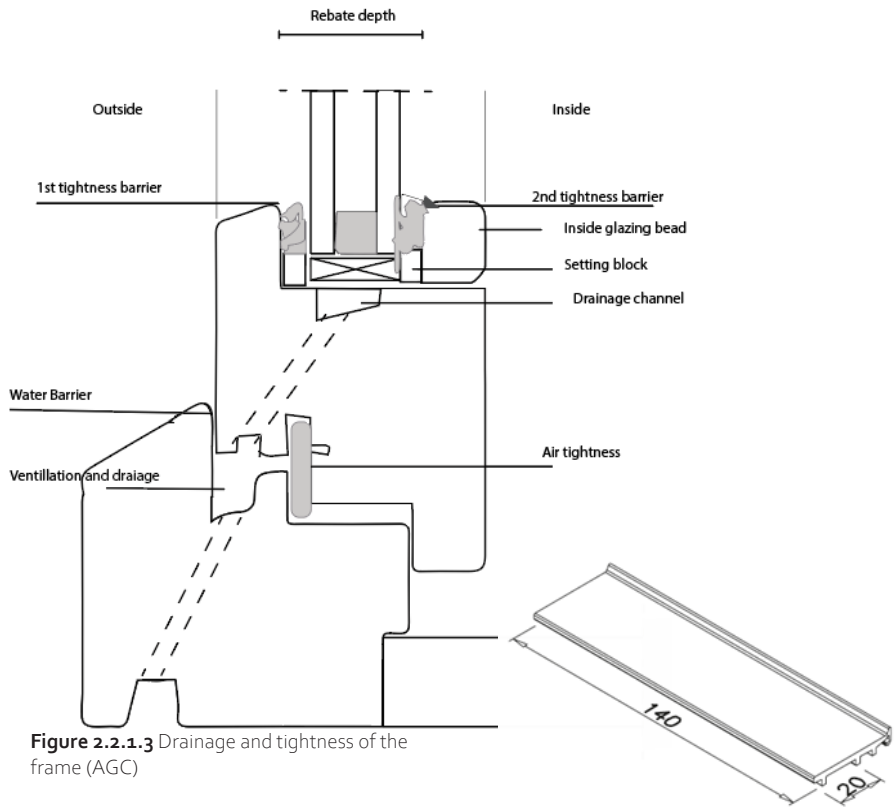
Drainage and tightness of the frame (AGC)
